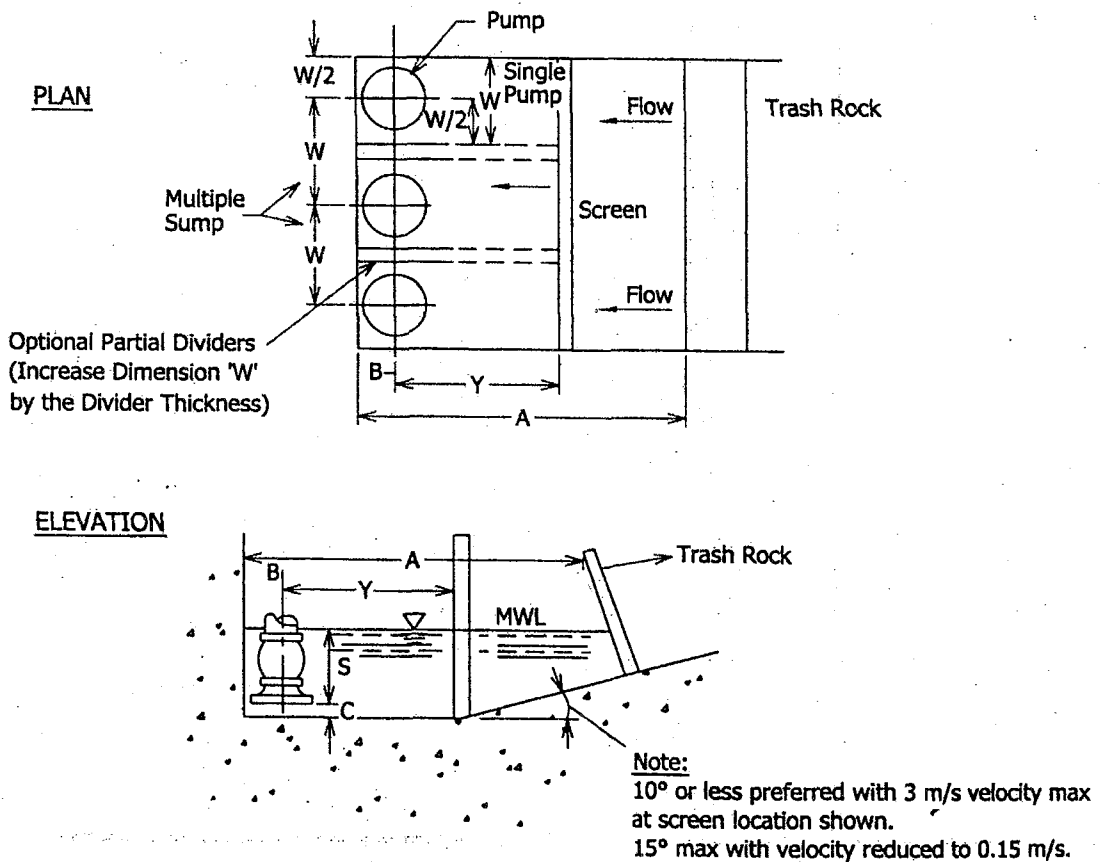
Wet Pit Type Pumps; Plan and Elevation (see Figure 45.7a for dimensions)
